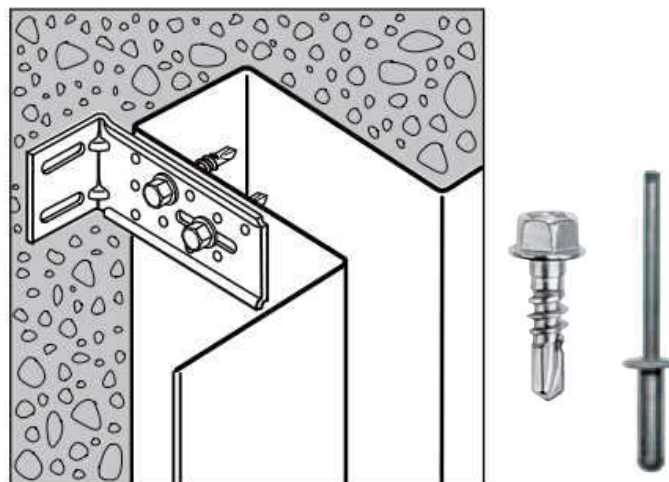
Fixing the galvanised steel profiles to the supporting squares ($\varnothing \geq 5.5$ screws or $\varnothing \geq 4.8$ rivets)
